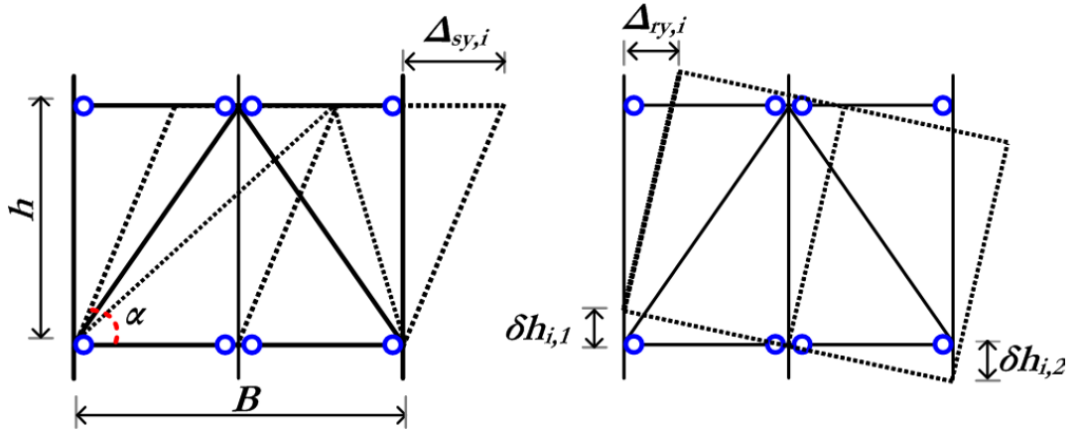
(a) Sway Mechanism Due to Yielding of Tension Brace, (b) Rigid Rotation of Floor Due to Outer Columns Deformation.
